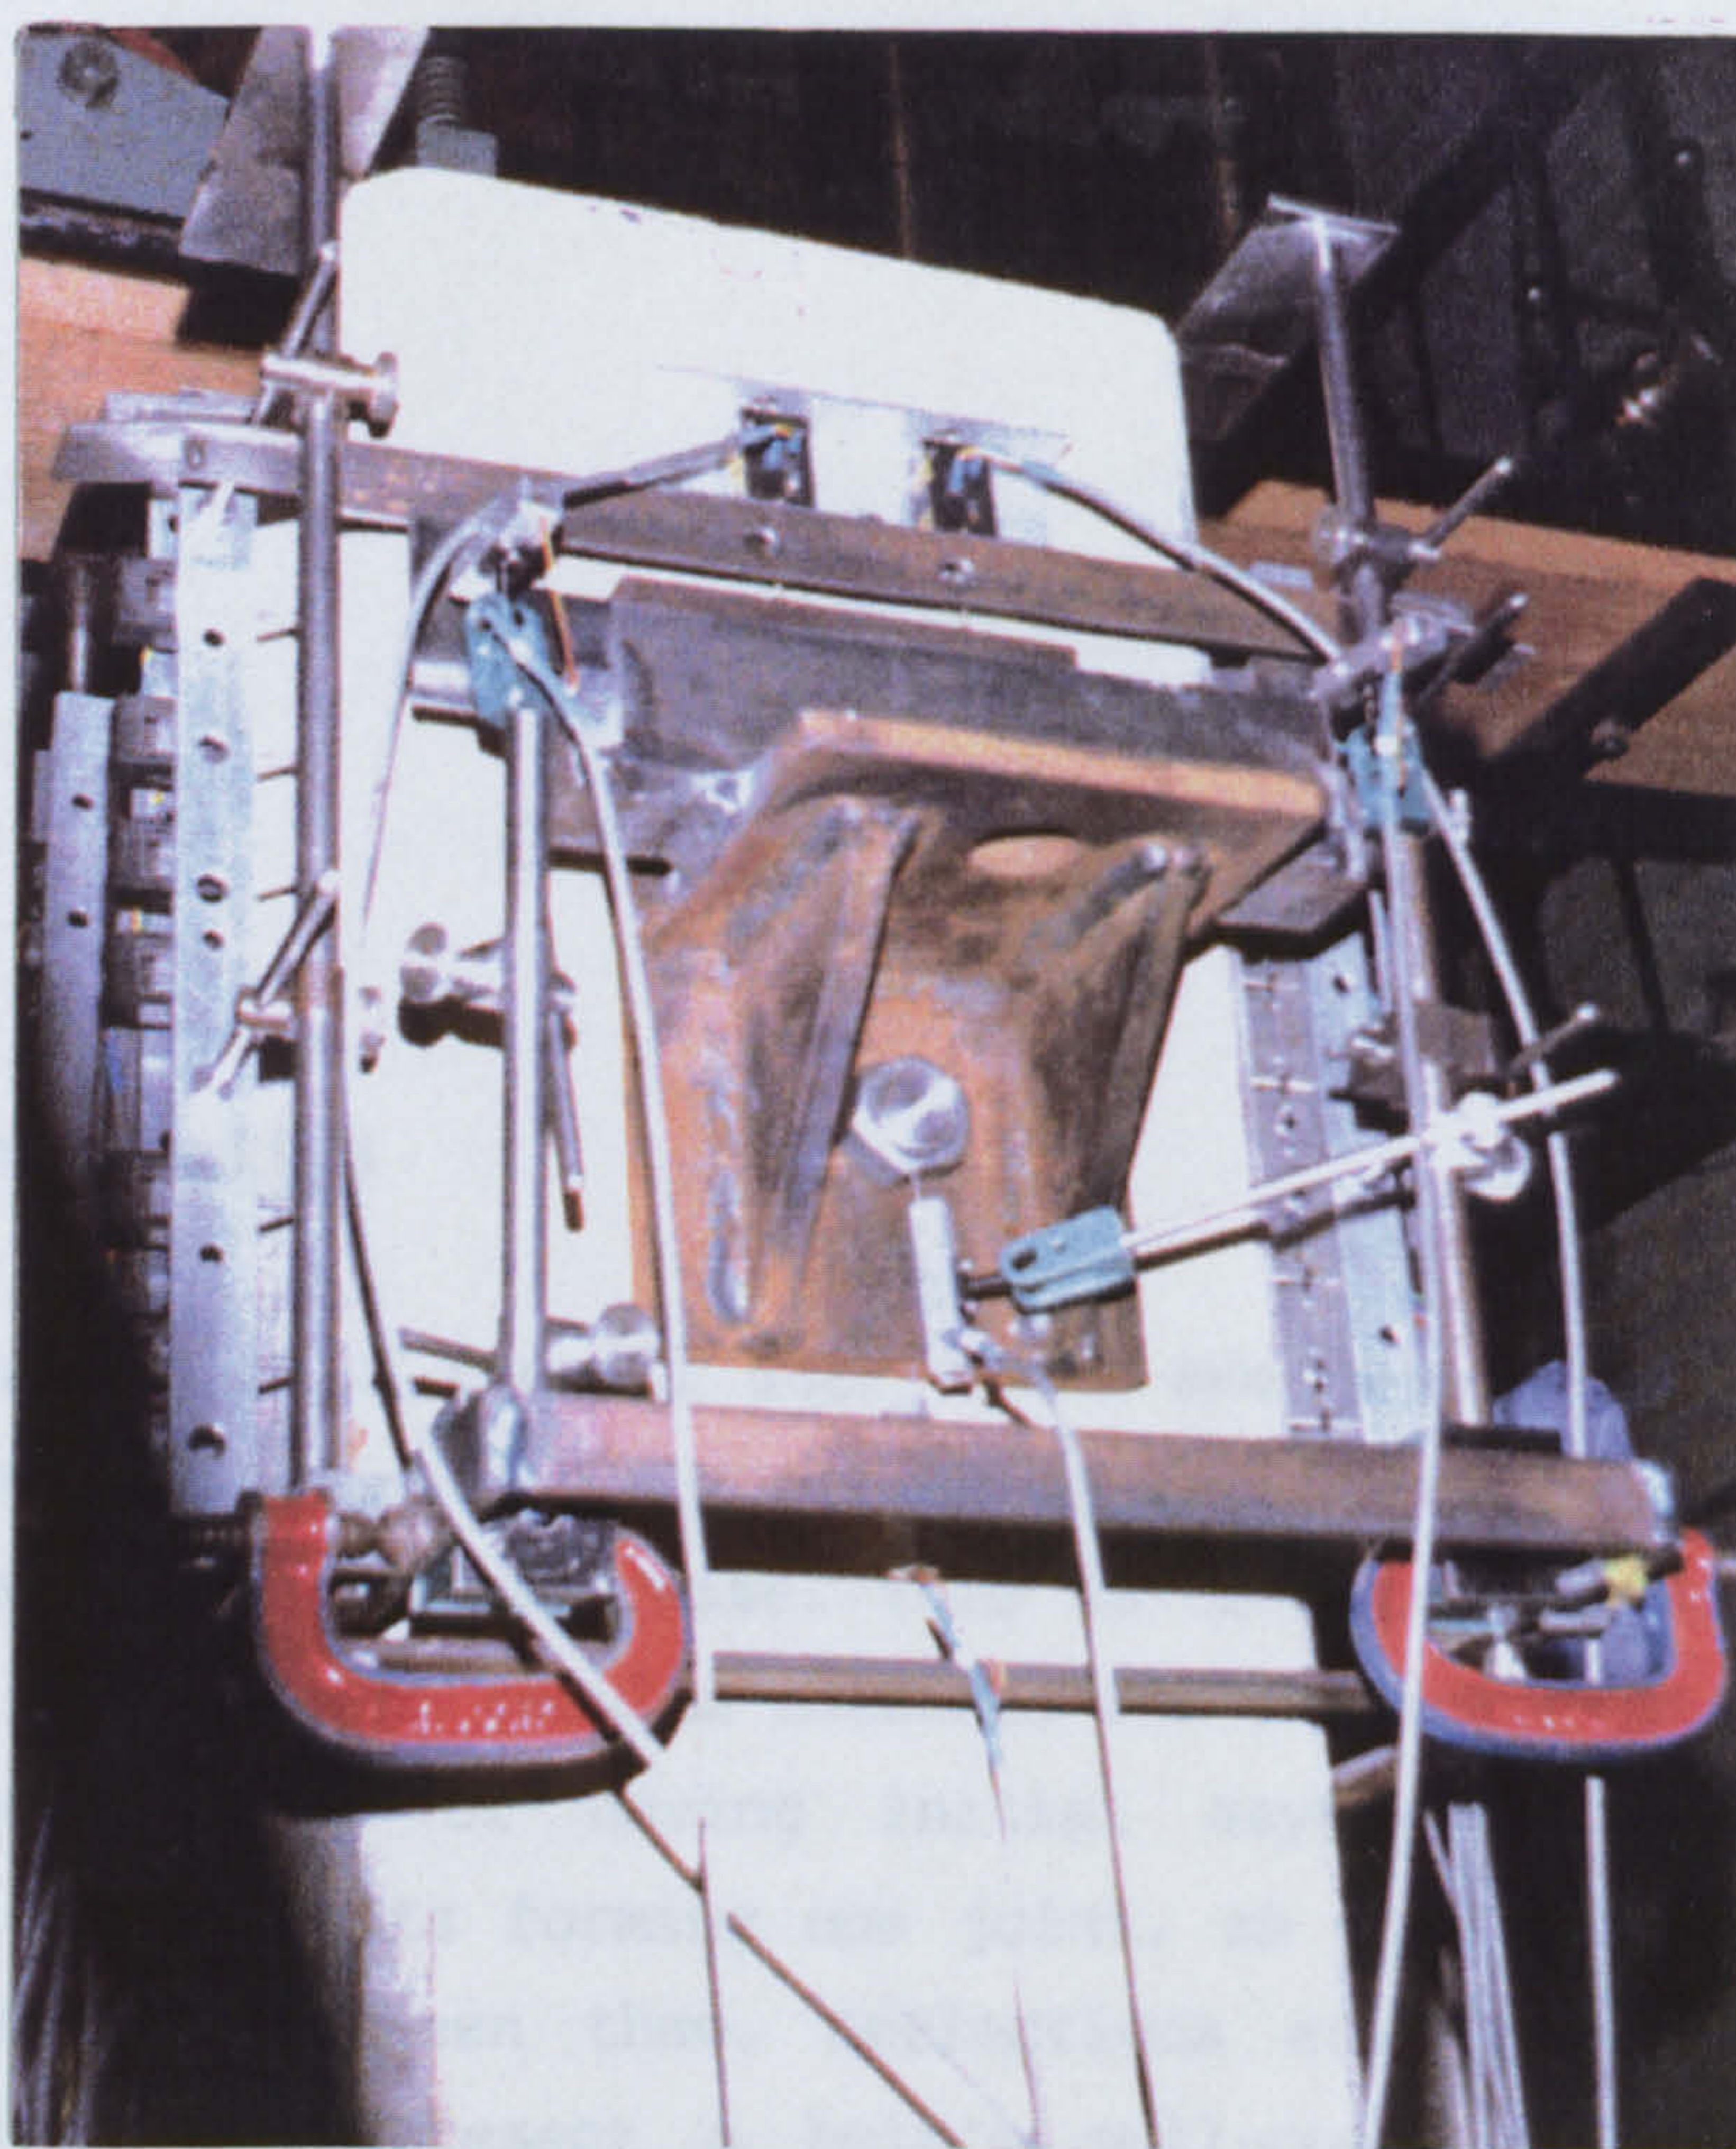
BRACKET CLOSE-UP SHOWING DETAILS OF THE TRANSDUCERS
